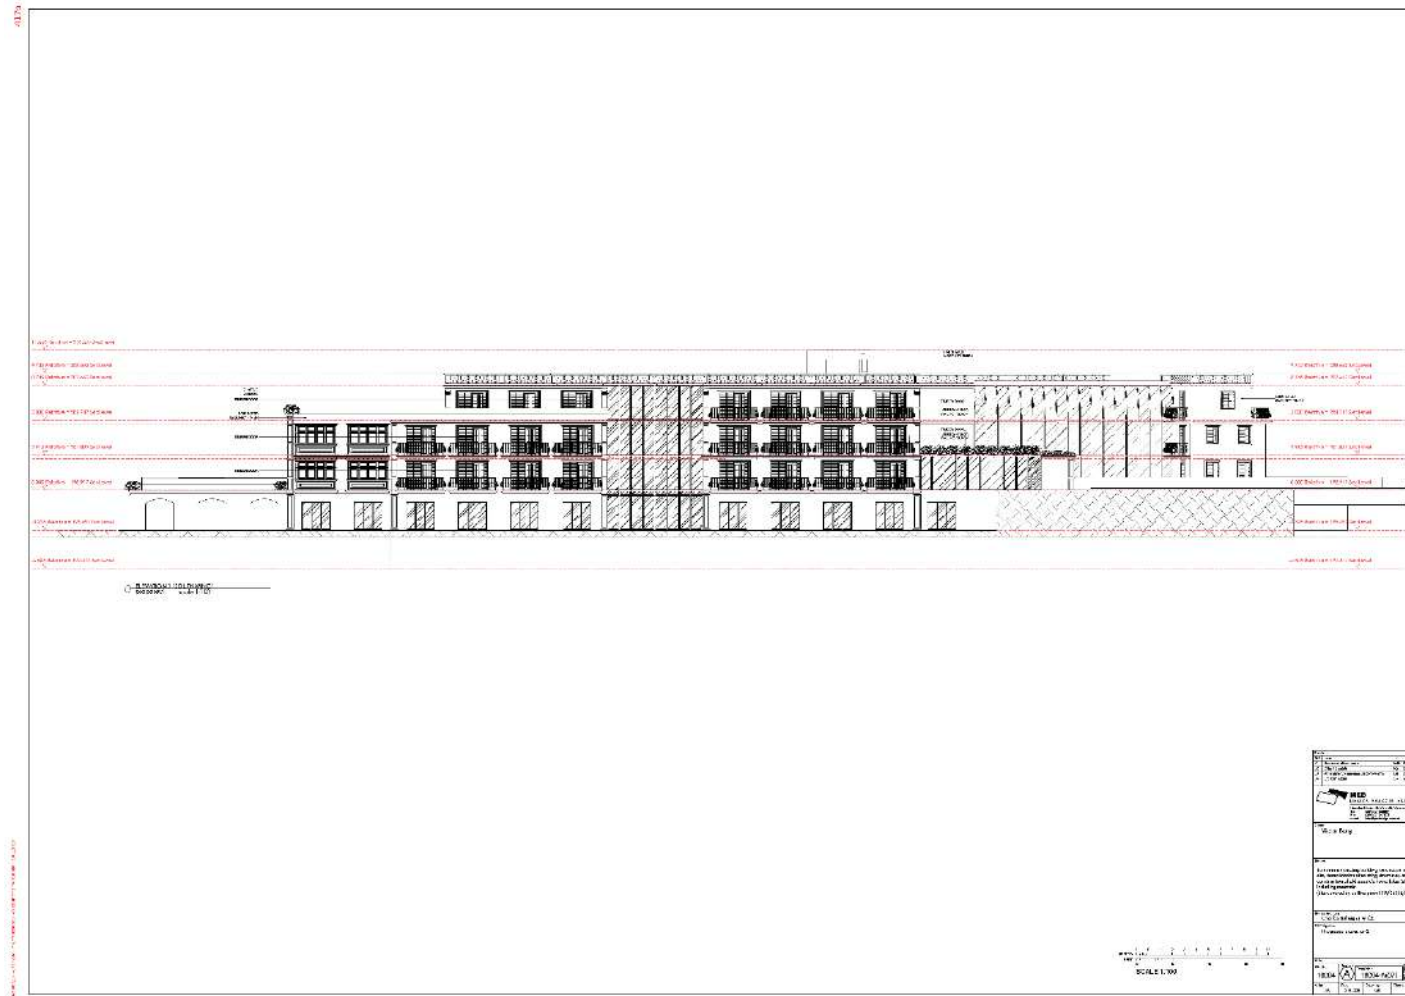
PROPOSED ELEVATION I SOUTH WING
